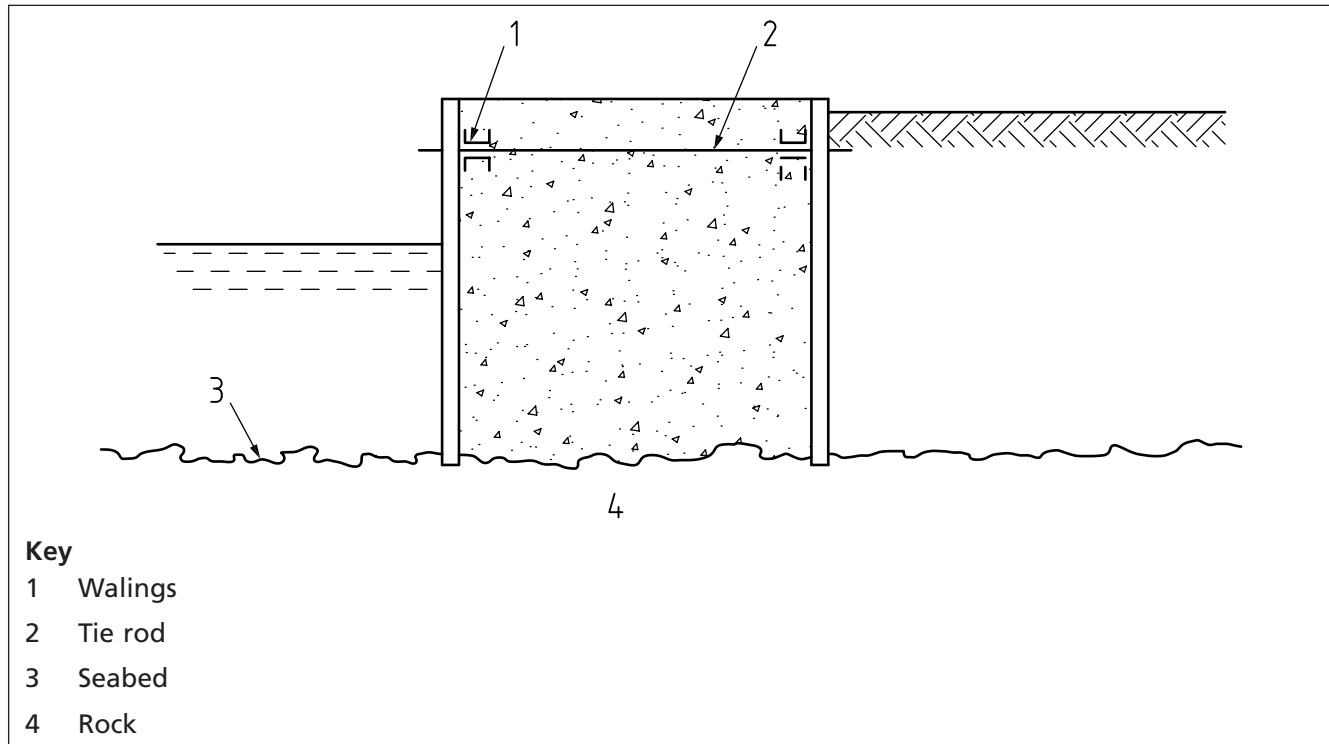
Double wall sheet pile structures – Sheet piles terminated on rock at seabed
